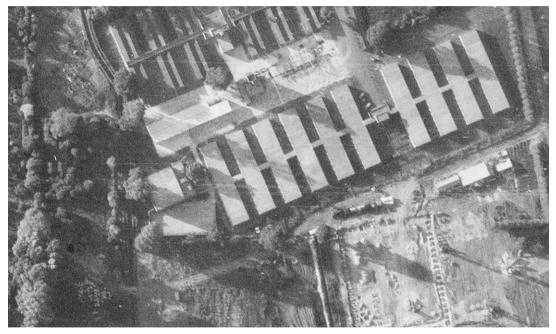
Aerial view of Cambridge site layout 1953 (HE)
